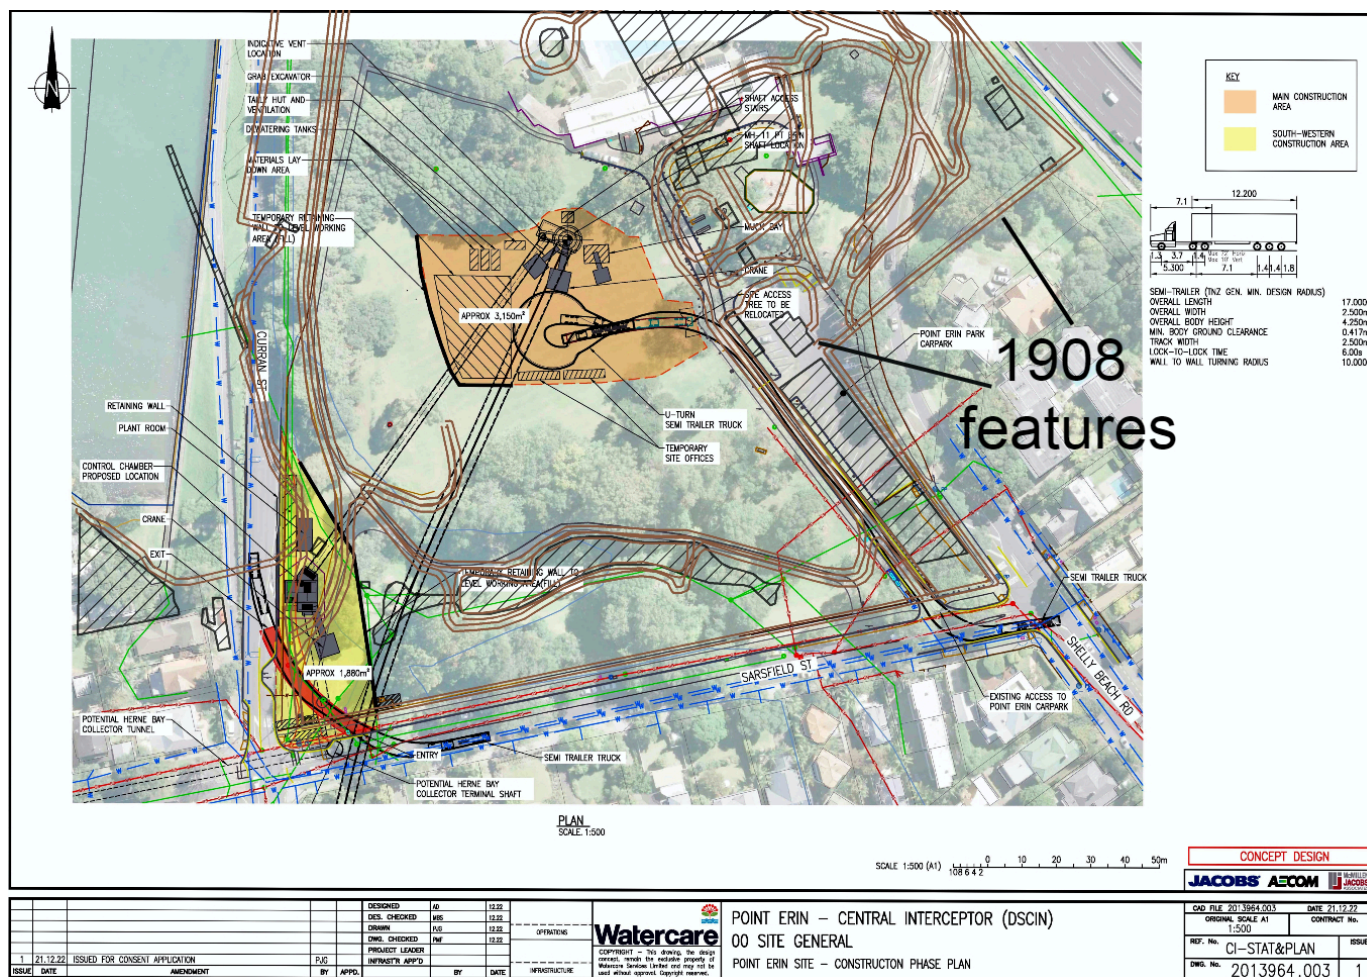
Aerial overlay of the 1908 Wrigg City Plan of Auckland (updated to 1919) showing the early layout of Point Erin Park and its buildings and features in relation to the proposed CI Extension construction areas
